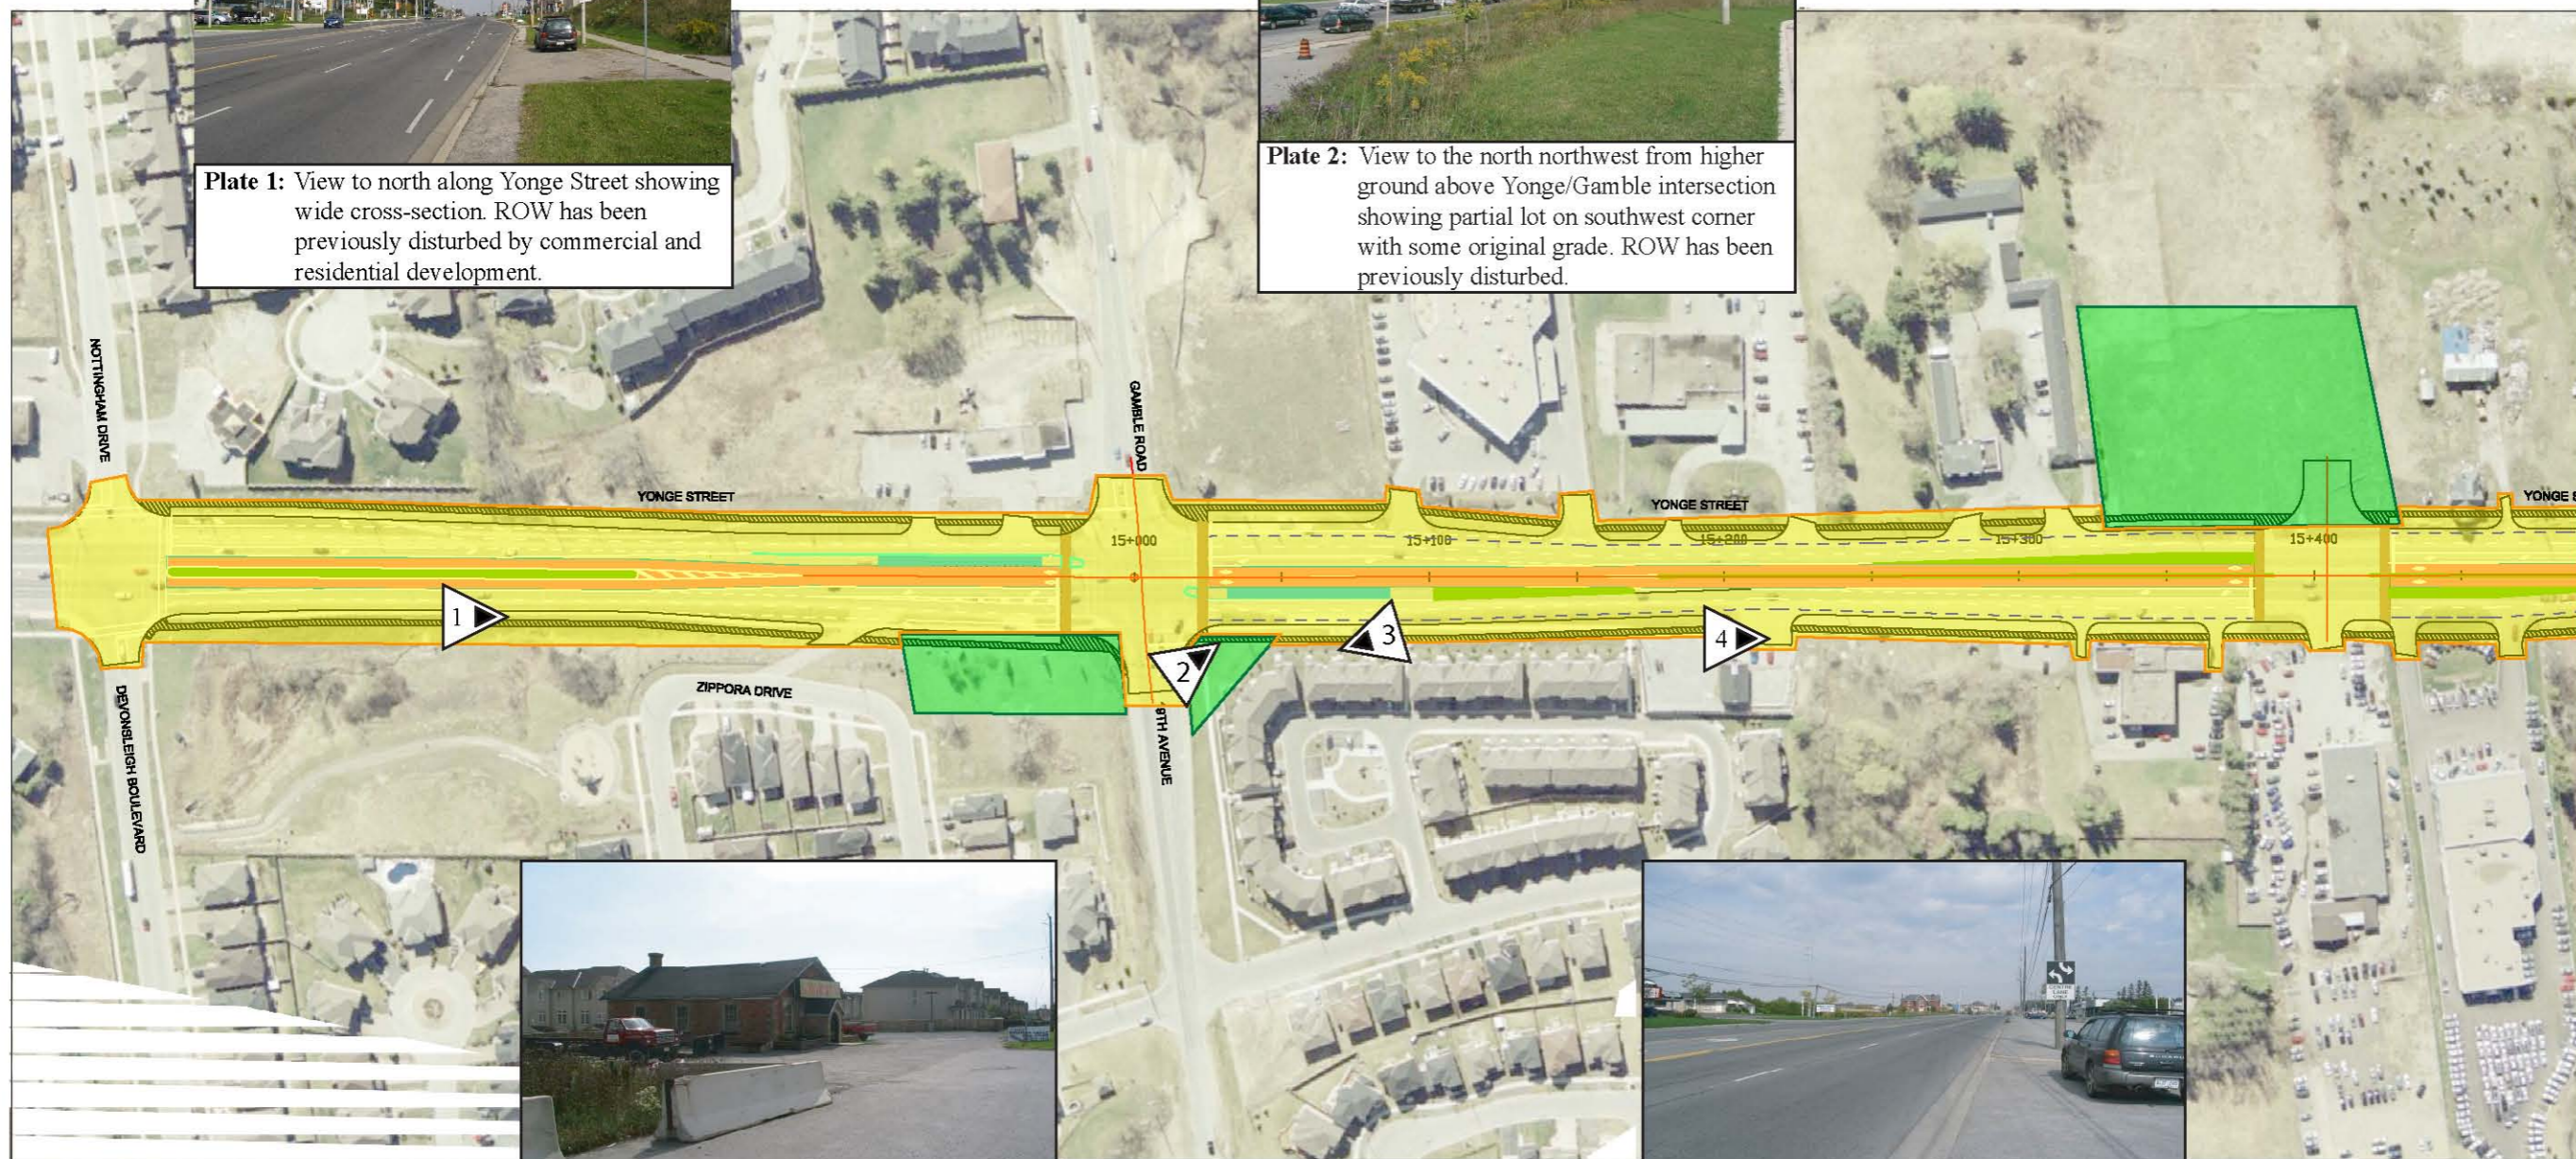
View to south southeast from north of Gamble Road showing mid-19th century schoolhouse in original location, now a print and sign shop.
